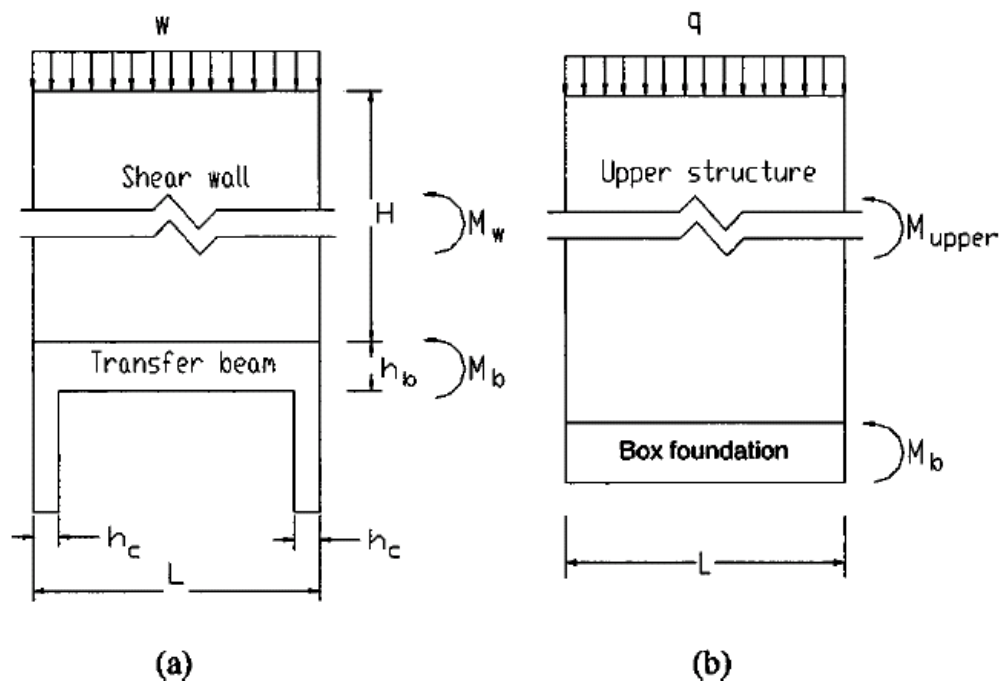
Box foundation analogy: a) Transfer beam–shear wall system; and b) box foundation and upper structure
